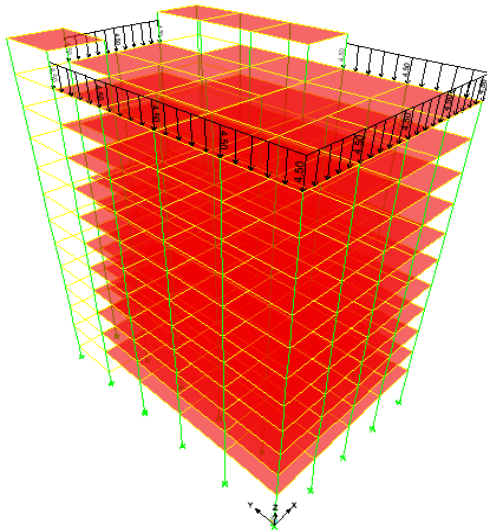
Parapet wall load 4.5kN/m under zone II and zone -IV
